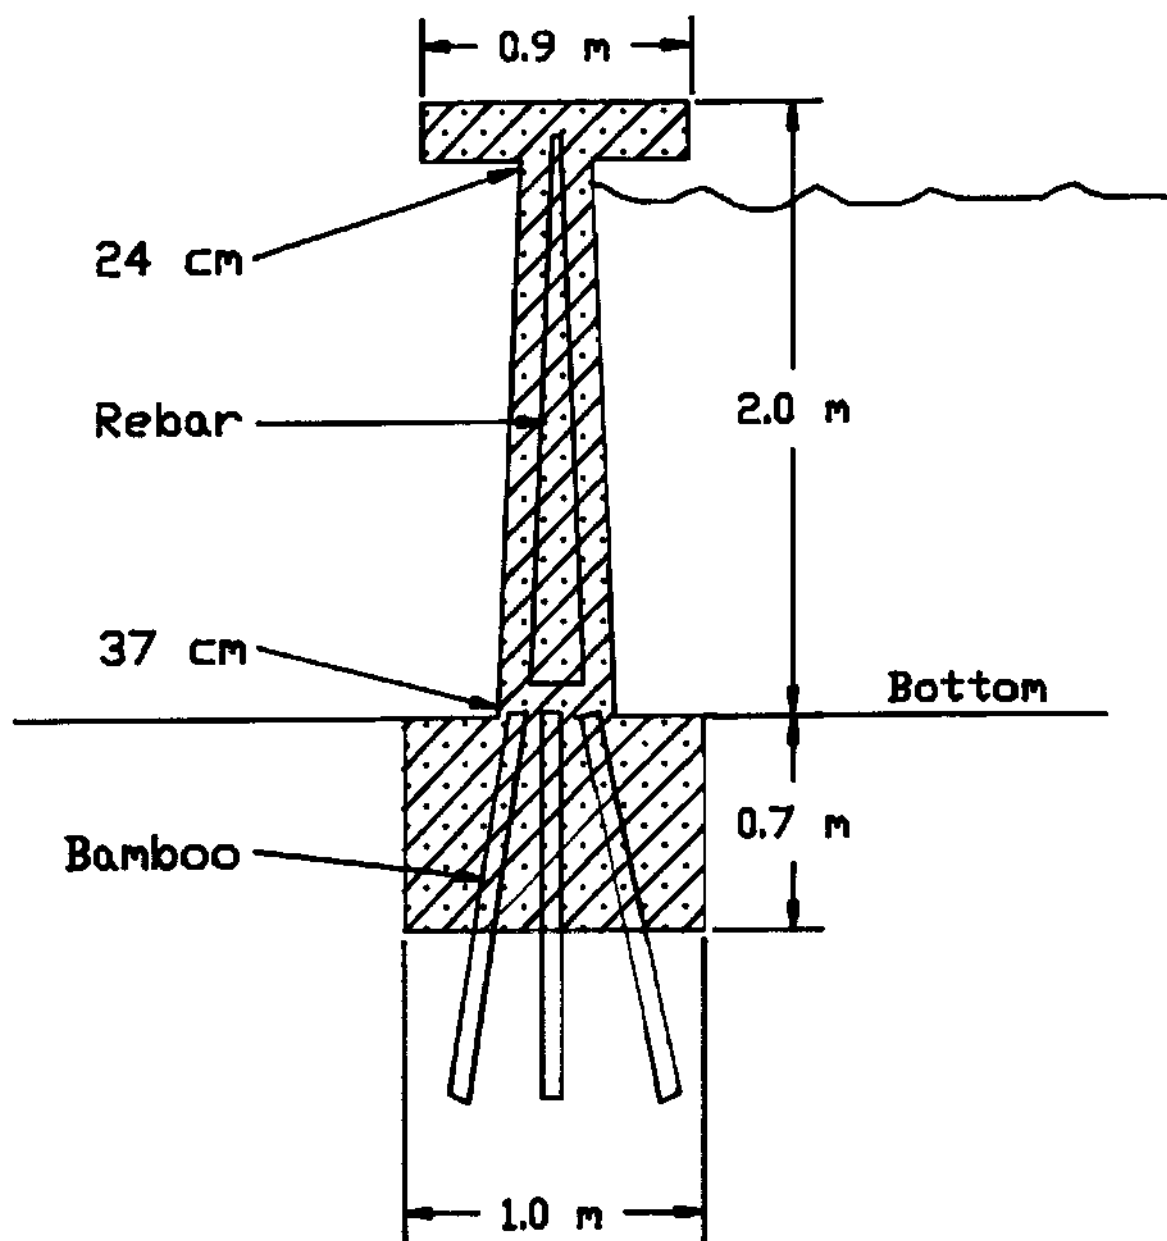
Cross-section of reinforced pond wall at farm 9.
